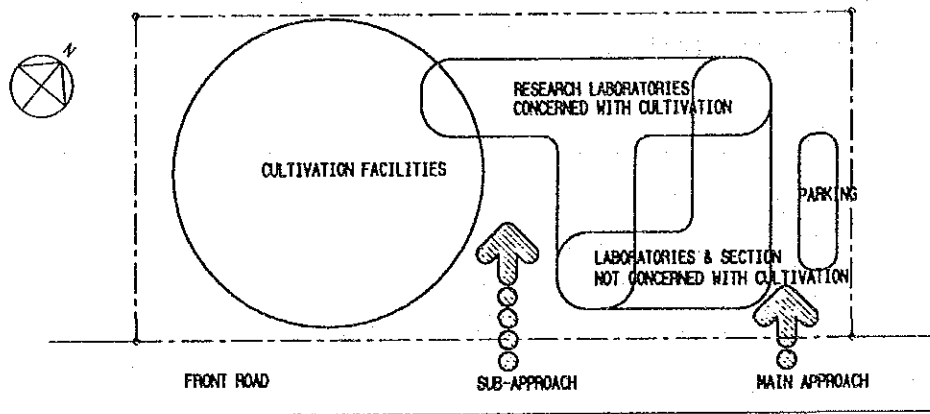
CONCEPTUAL PLAN OF FACILITIES LAYOUT
